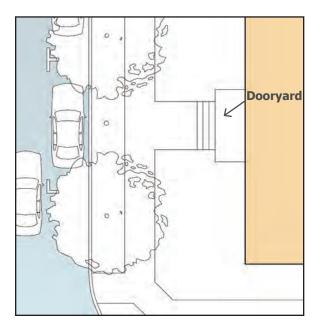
Plan View, Dooryard Frontage (Illustrative)
